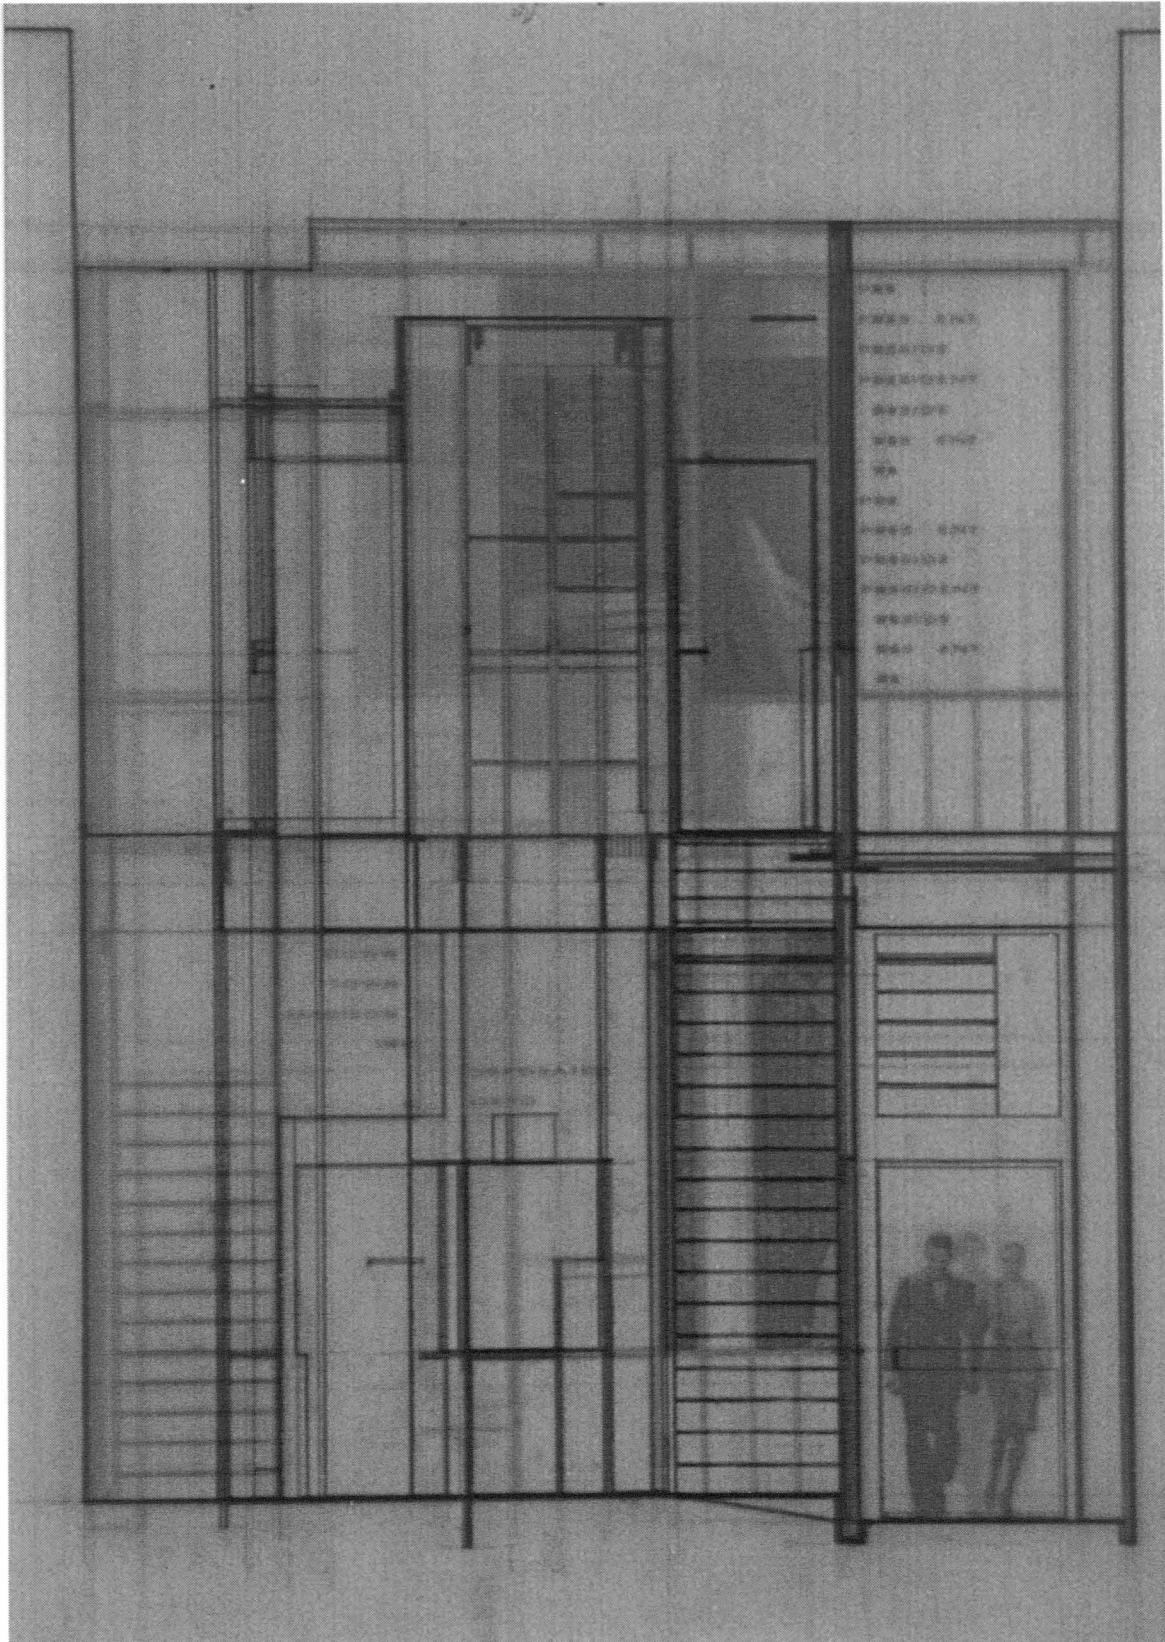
Chamber of Commerce- Full Parking Garage Elevation with Screens and Stairs
